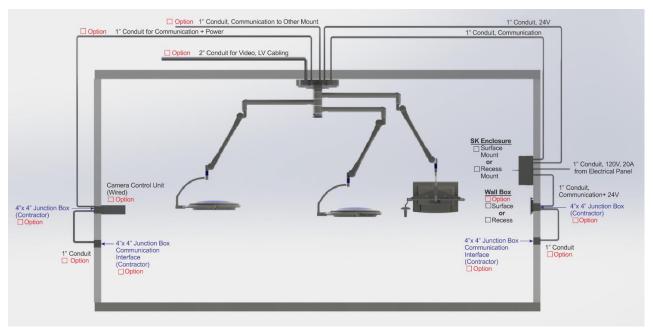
SK Enclosure (Standard Mount) Conduit Plan, Elevation View
